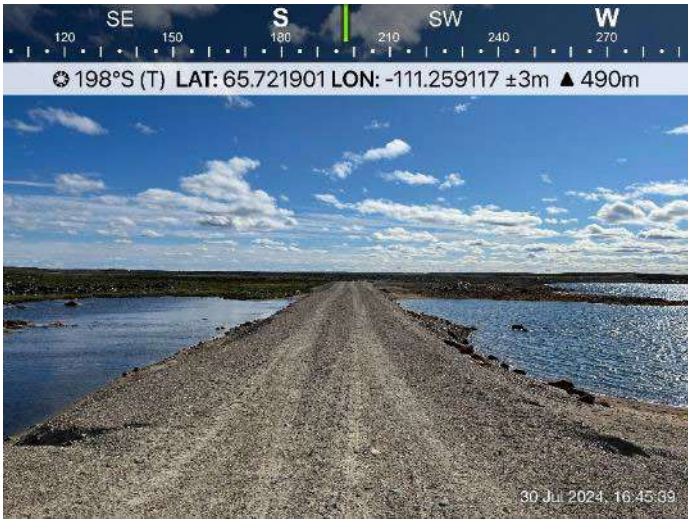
Overview of the South Divider Dyke crest as viewed from near its south abutment.
